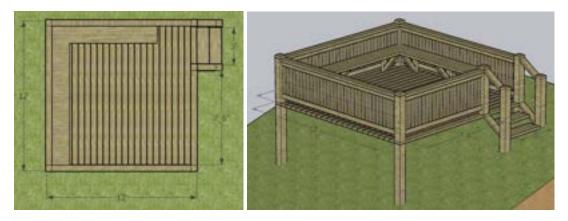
Lookout Deck plan view (left) and front perspective (right). Built-in benches are provided along the back and side of the deck opposite the entrance.
